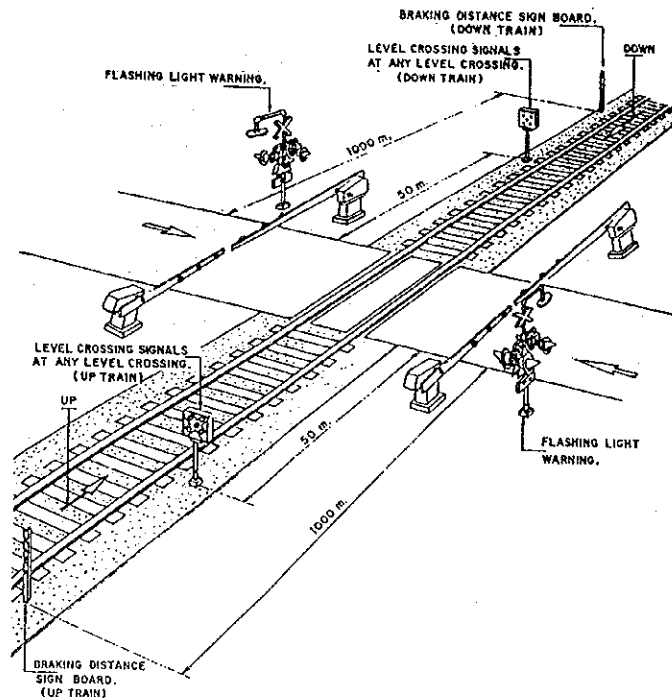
At-grade Crossing Protection with Full Width Lifting Barriers (B1f)
